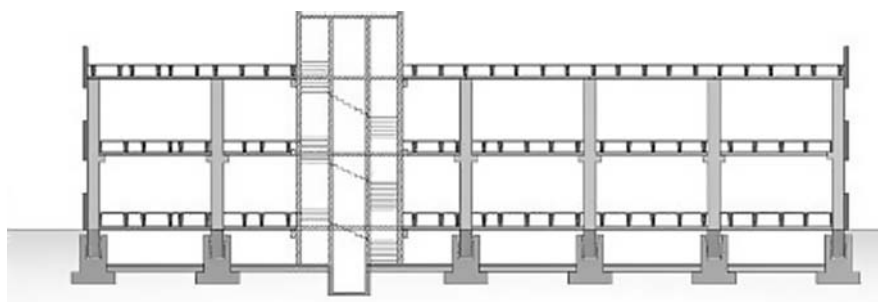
Subtype “10c”: multi-storey buildings with a precast structure fixed to a bracing cast-in-situ element
